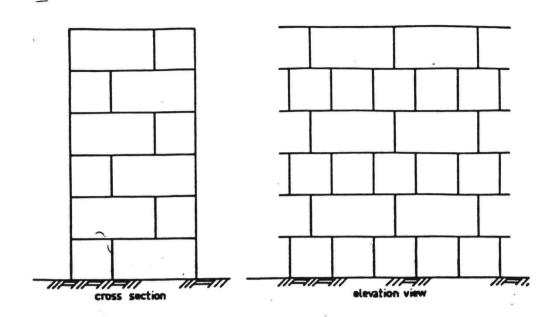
Typical Monolithic Breakwater (scale 1:150)
